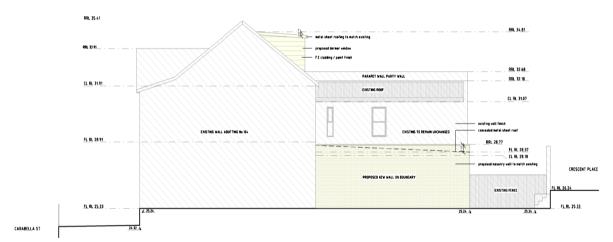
Proposed North West Elevation (D.A - 106 Issue A)
